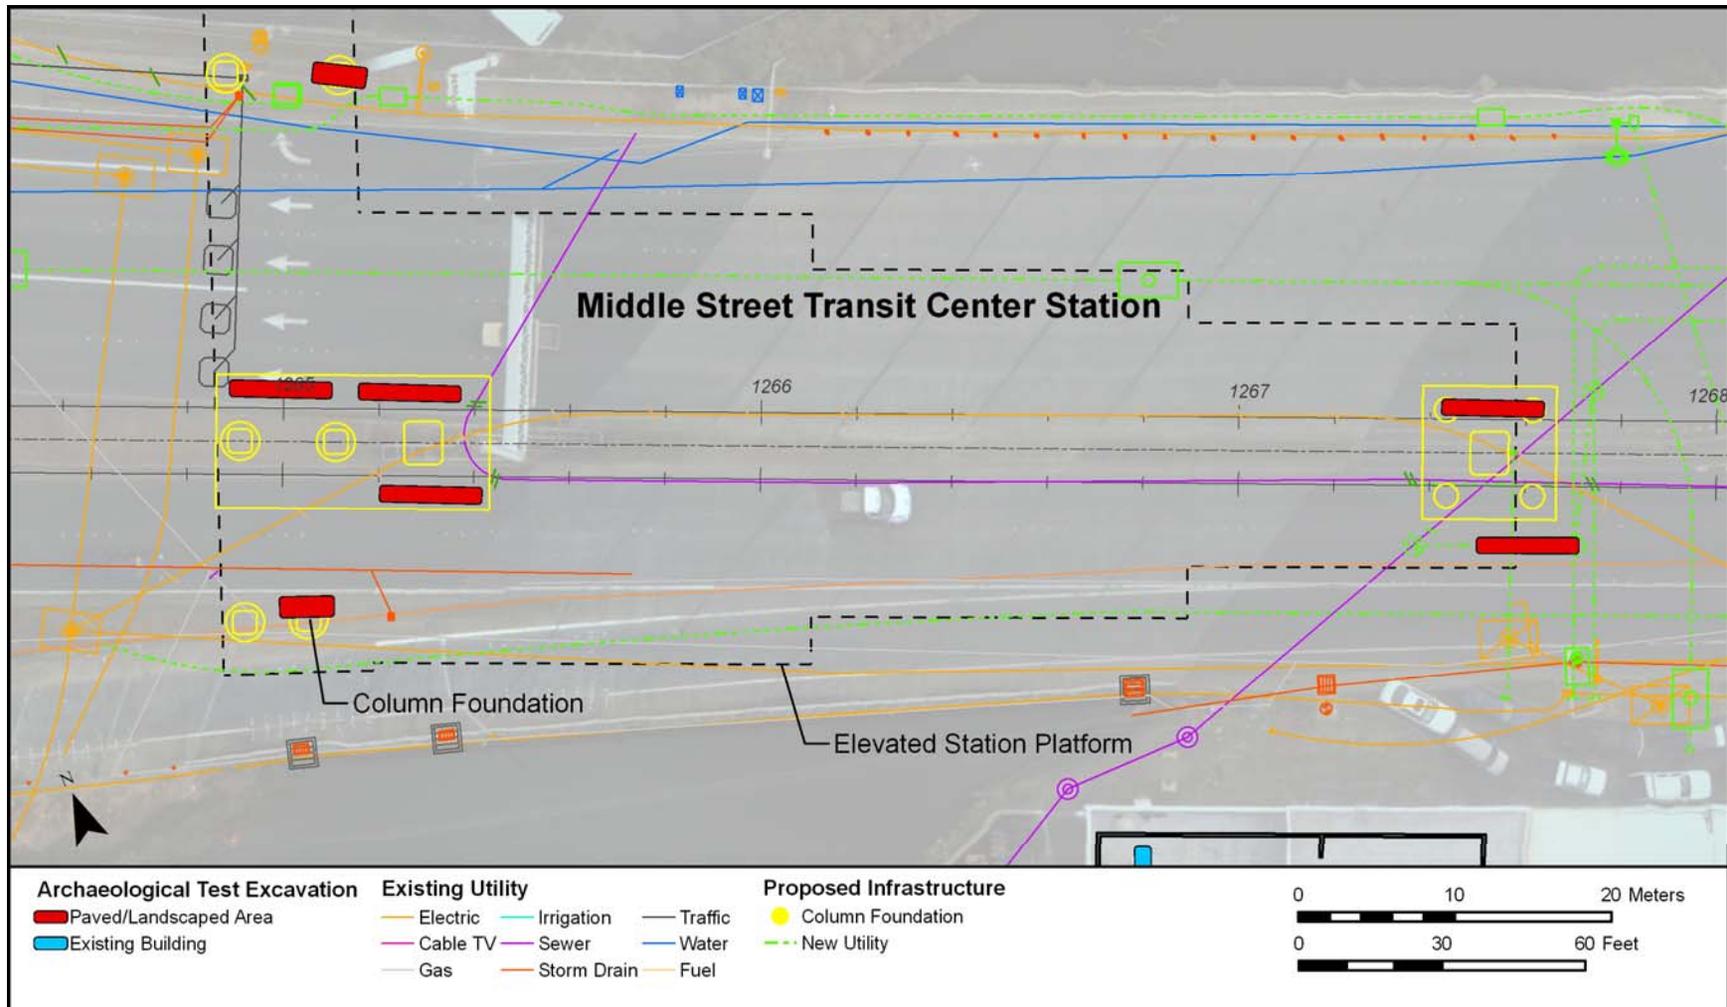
Middle Street Transit Center Station, detail of column foundation layout at Kamehameha Highway, showing proposed locations for archaeological inventory survey testing, including four 2' by 20' excavations and two 3' by 10' excavations at column foundations and an off-set test (2' by 20' excavation) at a sewer relocation
